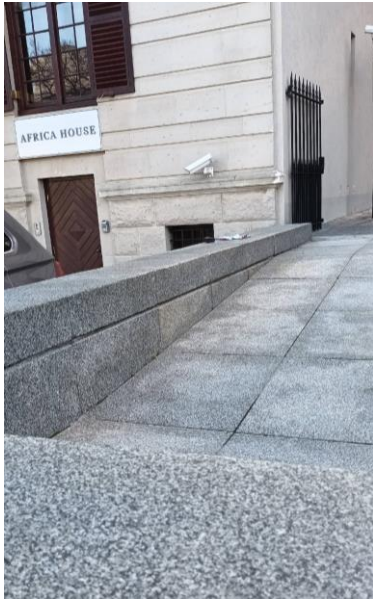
Existing ramp – providing access from 120 Plein to Stalplein.
